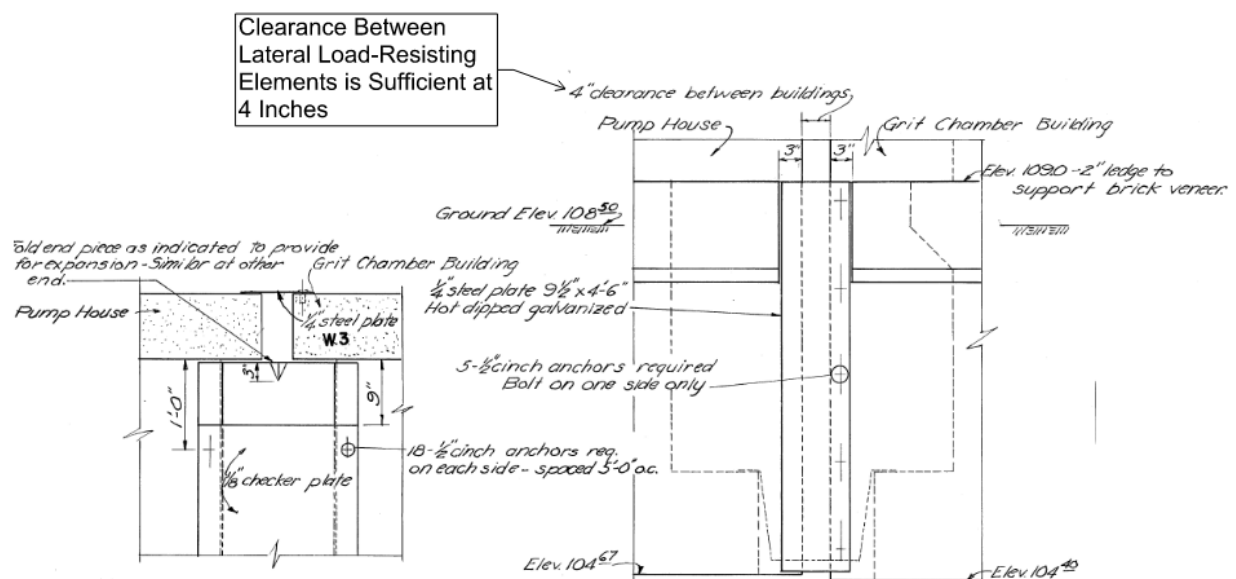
Original Expansion Joint Details at the Elevation 109 Ground Floor Level
